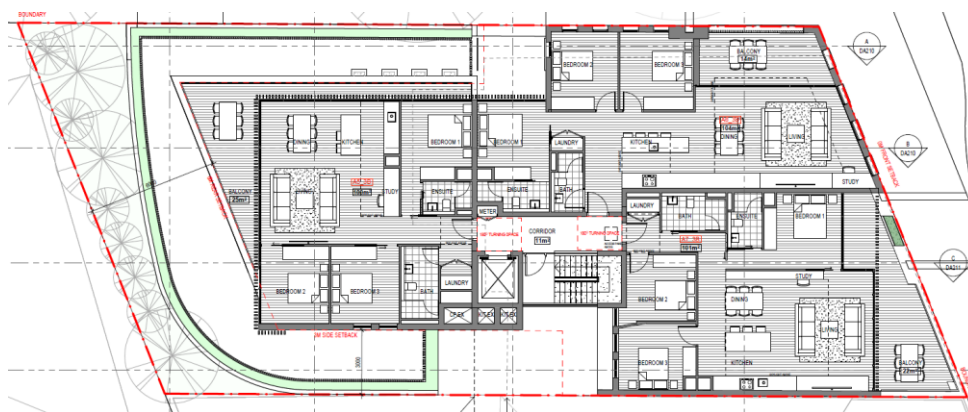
Originally proposed level 3 floor plan under the subject DA - 18-20A Perouse Road, Randwick
